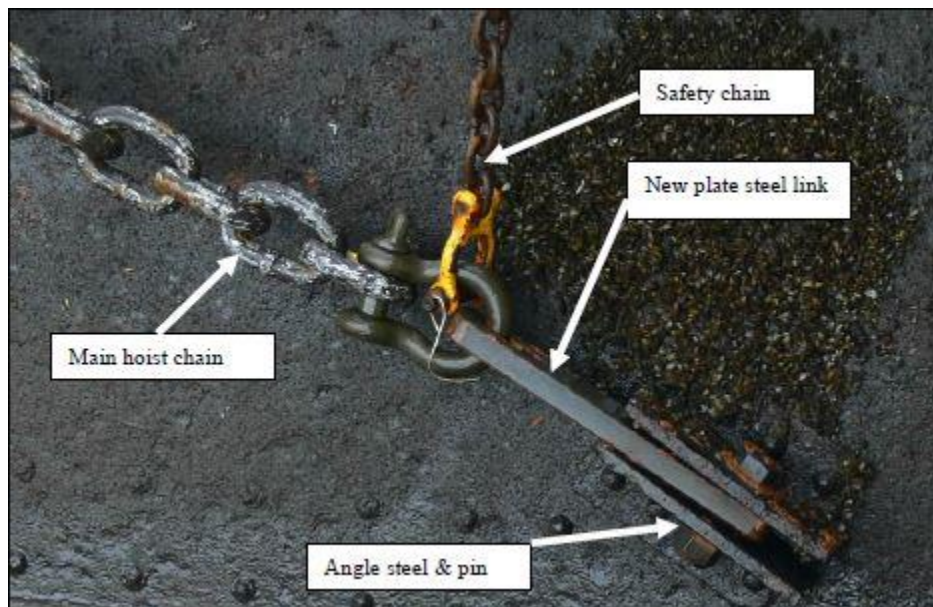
A-Frame Connection to Gate (Spicer 2019)
